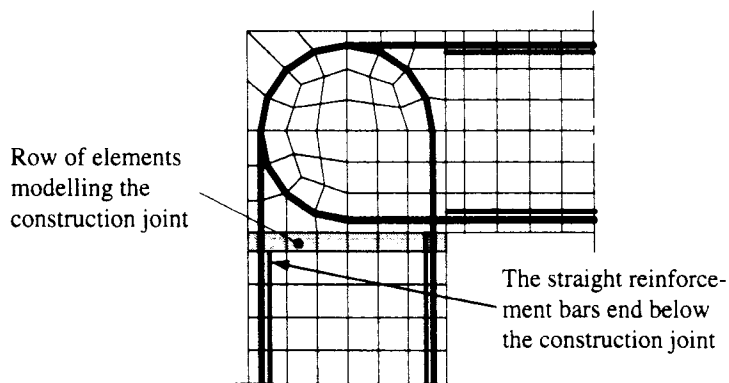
Modelling of the construction joint and the reinforcement bars in it.
